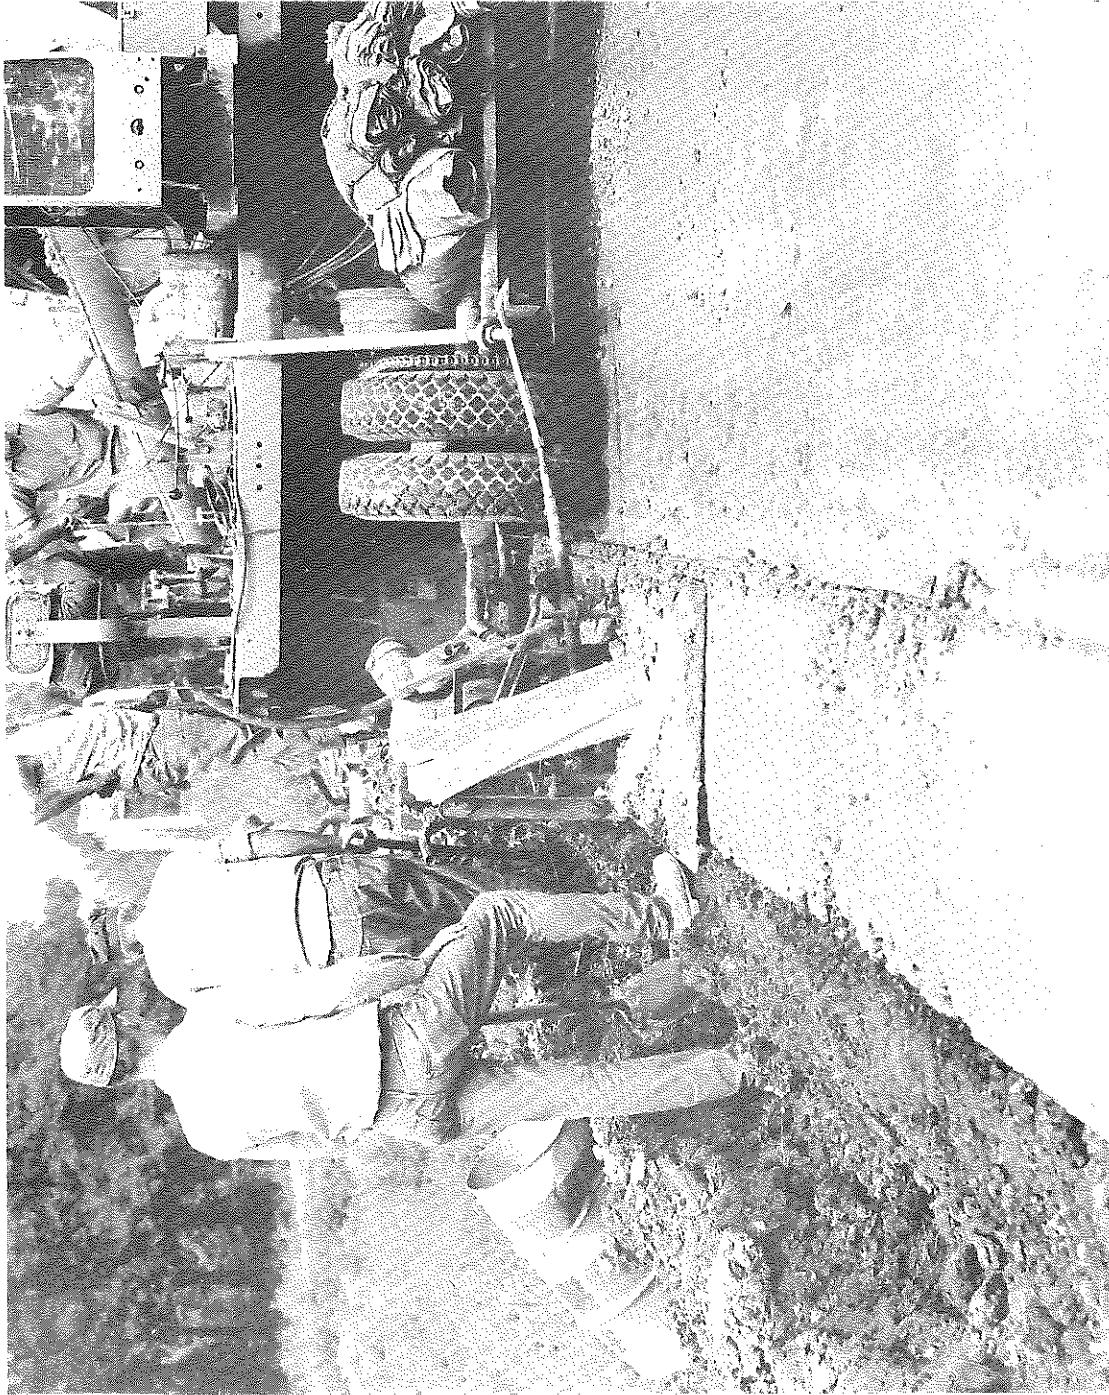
Vibratory Extrusion Plate on Slip-Form Paver. Note Rough Texture of Concrete.
